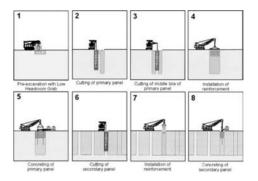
Diaphragm wall construction sequence (courtesy of Bauer/Piling Contractors).
